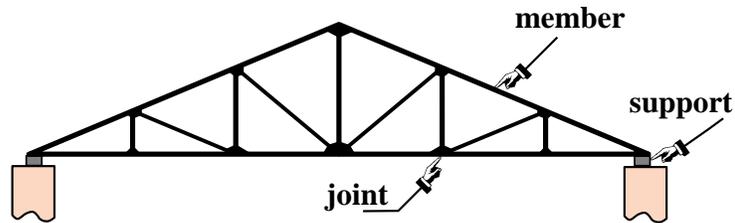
An actual plane truss structure. That shown is typical of a roof truss used in building construction for rather wide spans, say, over 10 meters. For shorter spans, as in residential buildings, trusses are simpler, with fewer bays.
